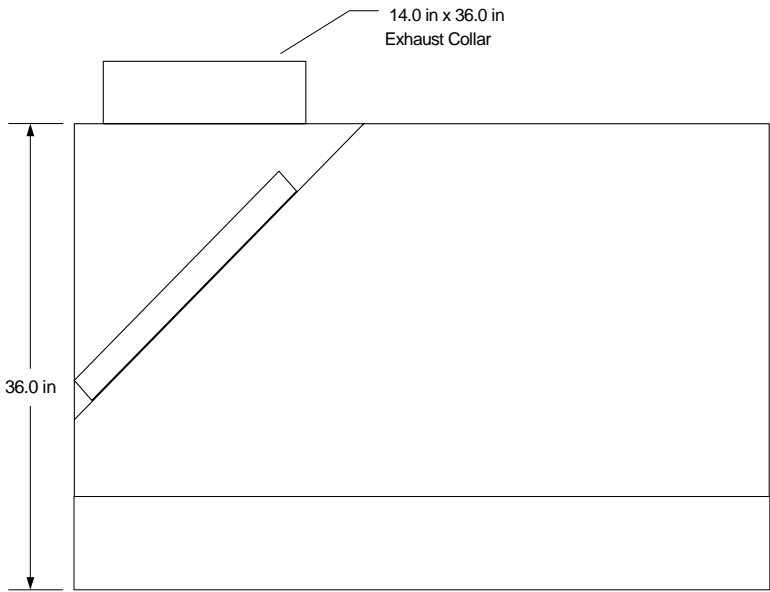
Cross Section Drawing of Hood with 1-Foot Hood Skirt Installed
